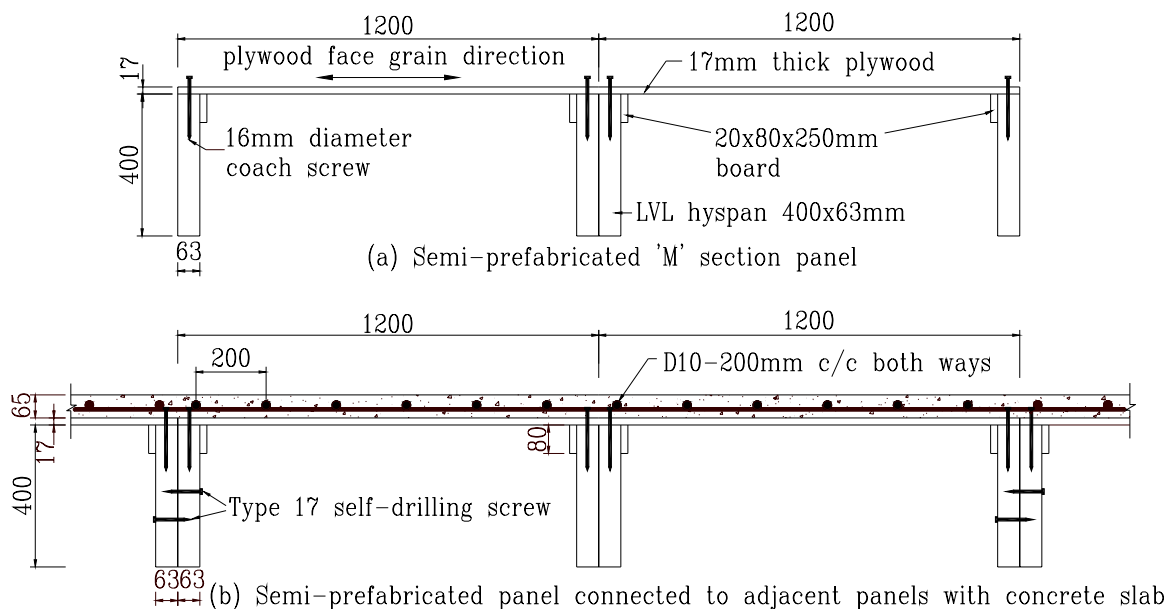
Semi-prefabricated “M” section panel (dimensions in mm)
